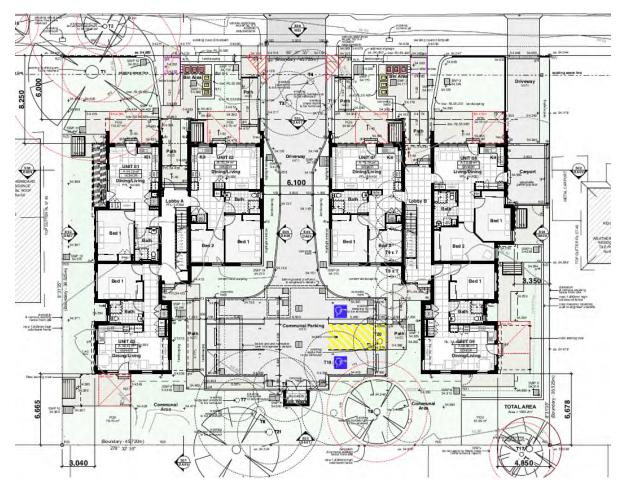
Extract from Architectural Plans – Site Plan (Source: Architectural Plans, Stanton Dahl Architects, dated 23/06/2023)
